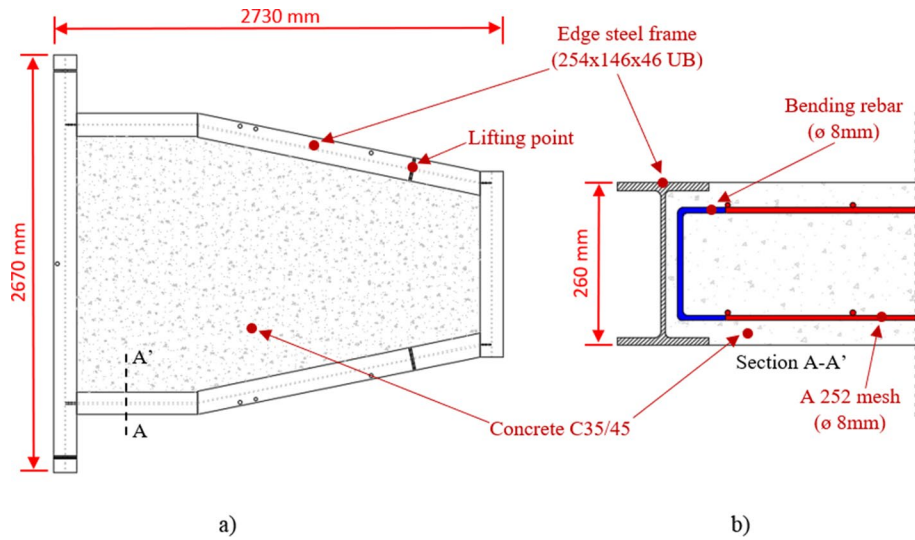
Specimen foundation system: a plan view and b section near the foundation edge
